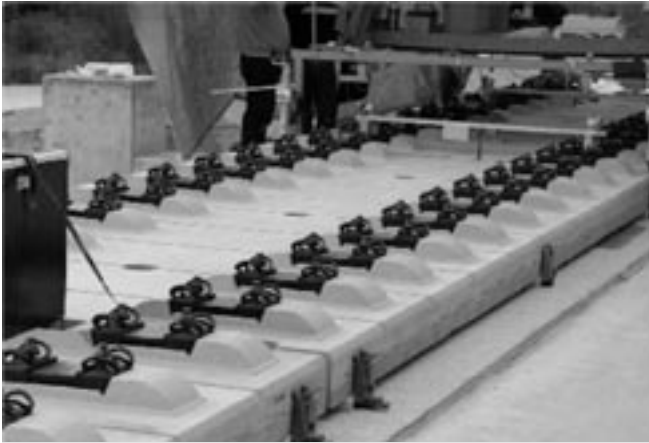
Bögl ballastless track system: accurate levelling of pre-cast concrete slabs on the hydraulically bound sub-base
